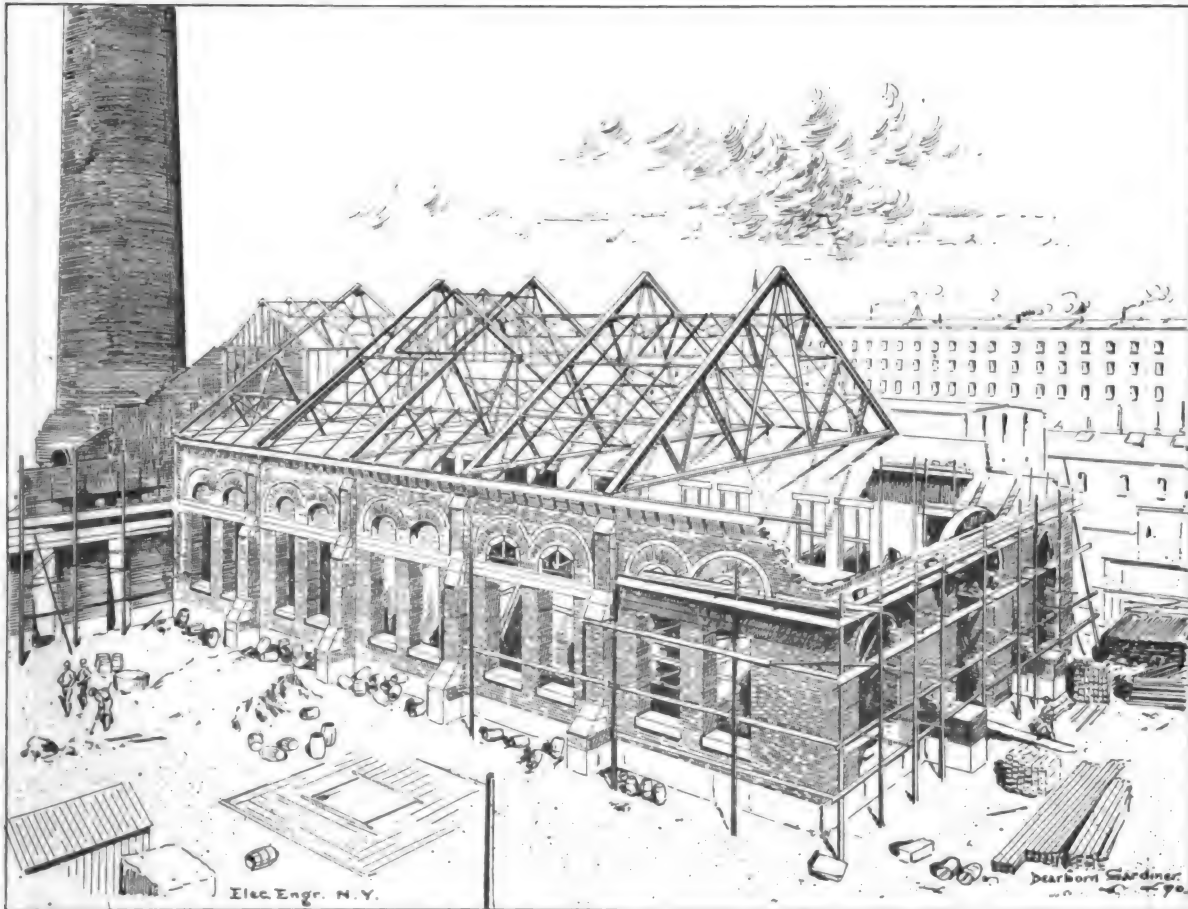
BOILER HOUSE, ELECTRIC POWER STATION, WEST END RAILWAY, BOSTON, MASS.
